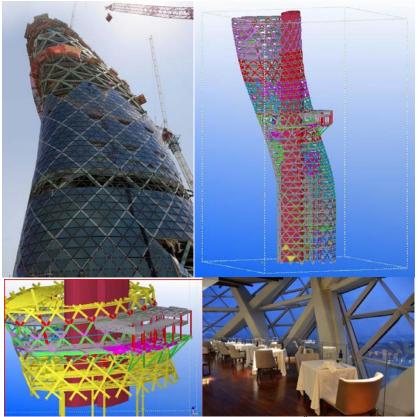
Capital Gate: The construction of the tower (top left)⁸; Tekla diagram of the entire tower revealing the concrete core (top right)⁹; Tekla drawing of the structure at the 18th floor, restaurant level and pool projection on the 19th floor (bottom left)¹⁰; interior view of the restaurant on the 18th floor illustrating the presence of the architecturally exposed welded steel diagrid frame.
